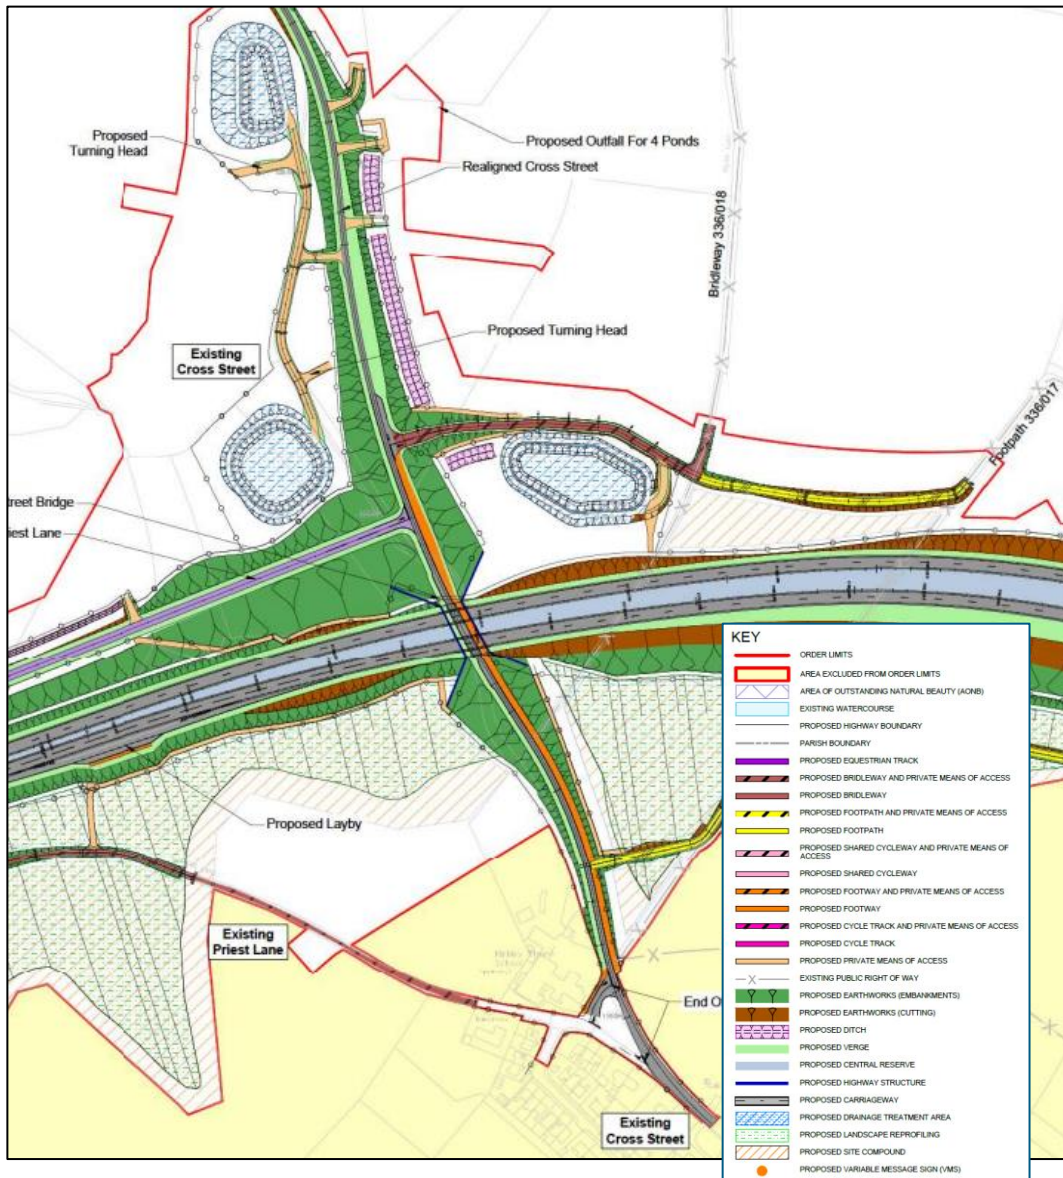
(a) Extract from General Arrangement Drawing (Before)
